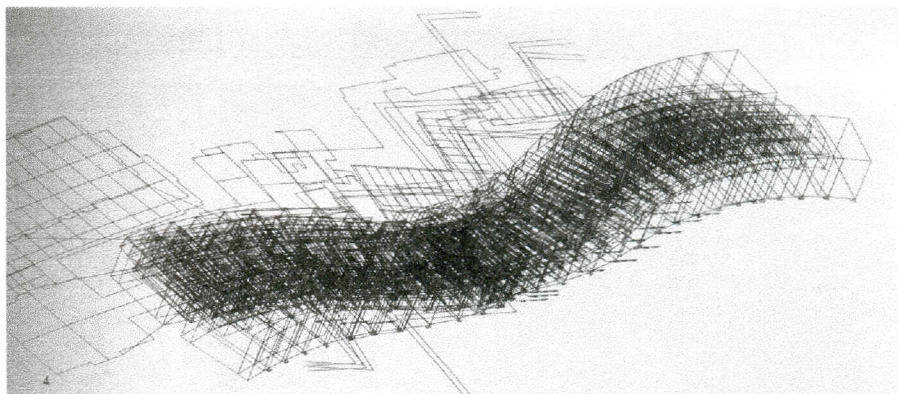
The structural order of Aronoff Center (source: Lynn, 1996)
